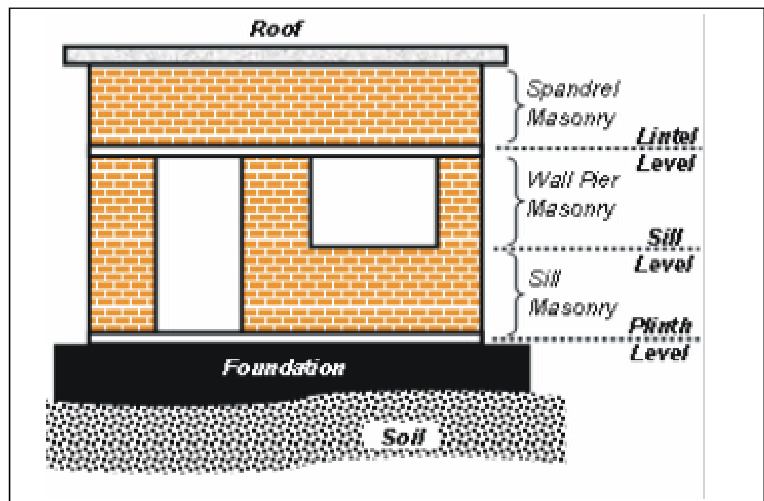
Sub-units in masonry building – walls behave as discrete units during earthquakes.
